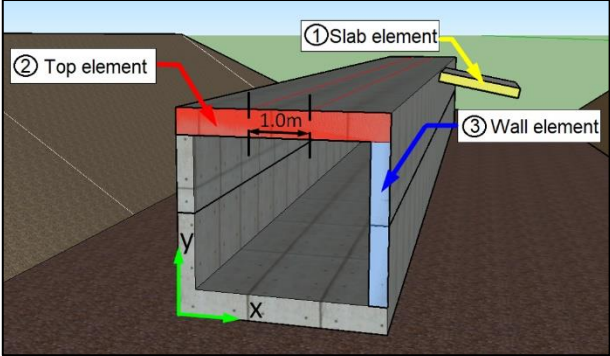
Simplifications made for a concrete culvert when transforming it into plane-strain as elastic plate elements
